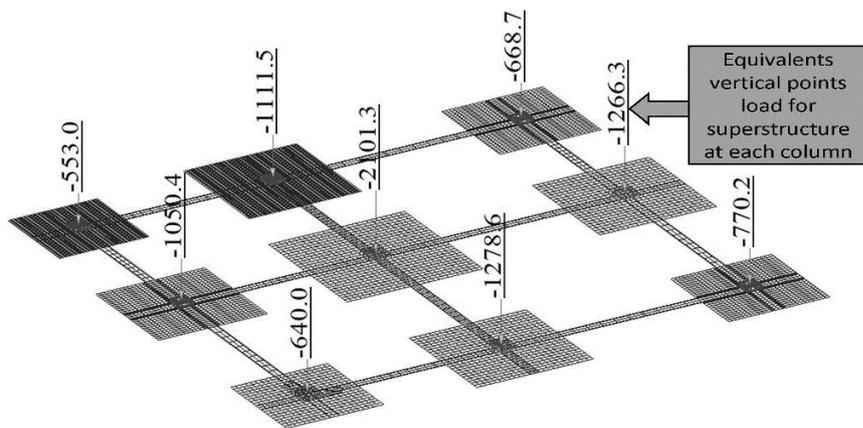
3D Winkler model of footings by MIDAS GEN.
